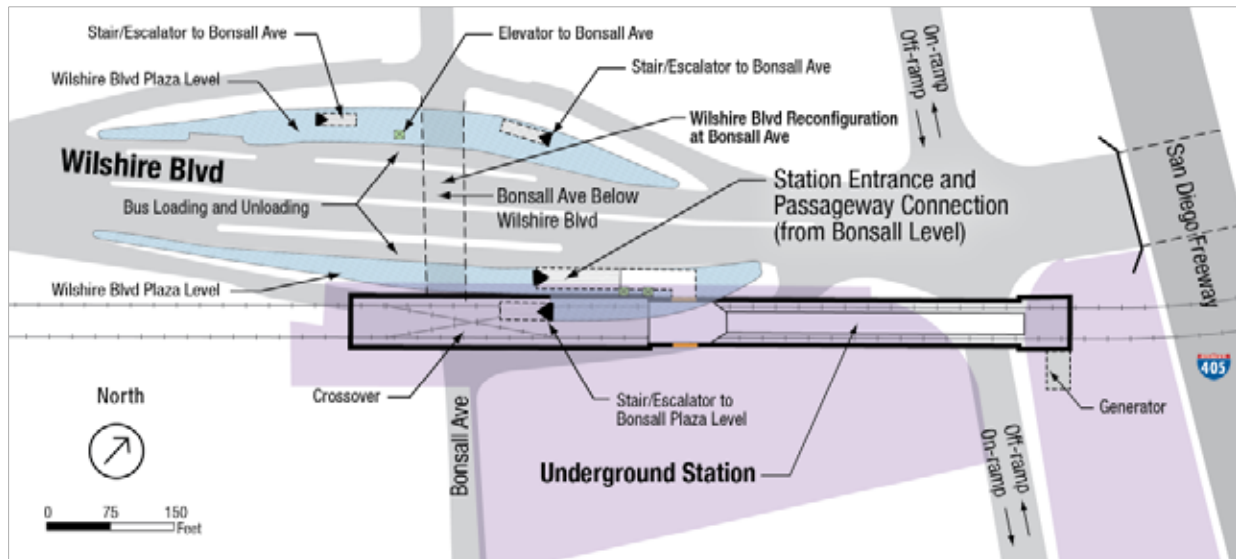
Westwood/VA Hospital South Station Site Plan
